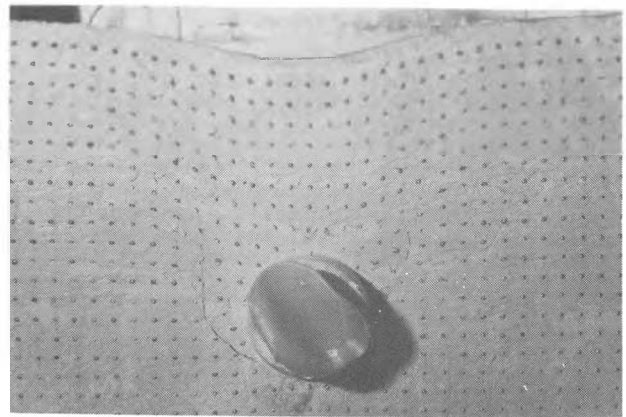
View of a typical 2D model tunnel after failure (C/D = 1.8)
